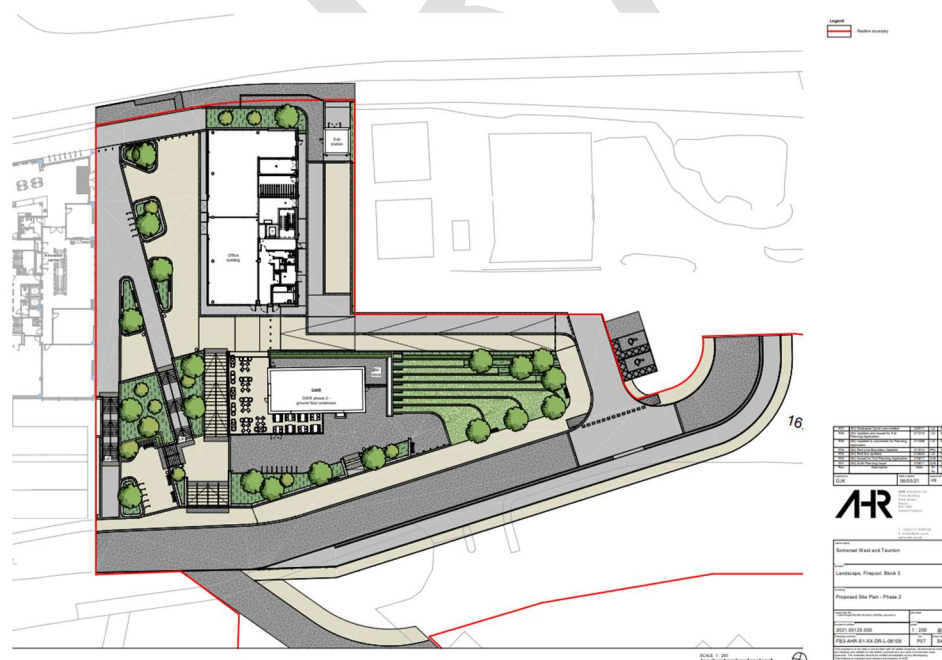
Approved Block 3 plan showing cycle route running to the east of the main office building to join Canal Road
